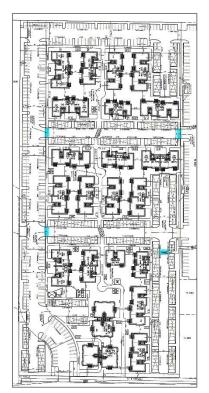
(blue indicates extension of walkway poured concrete)
